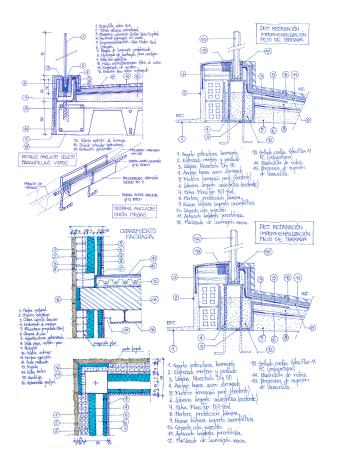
Construction details of joints and connections on-site (graphic elaboration by the authors).
